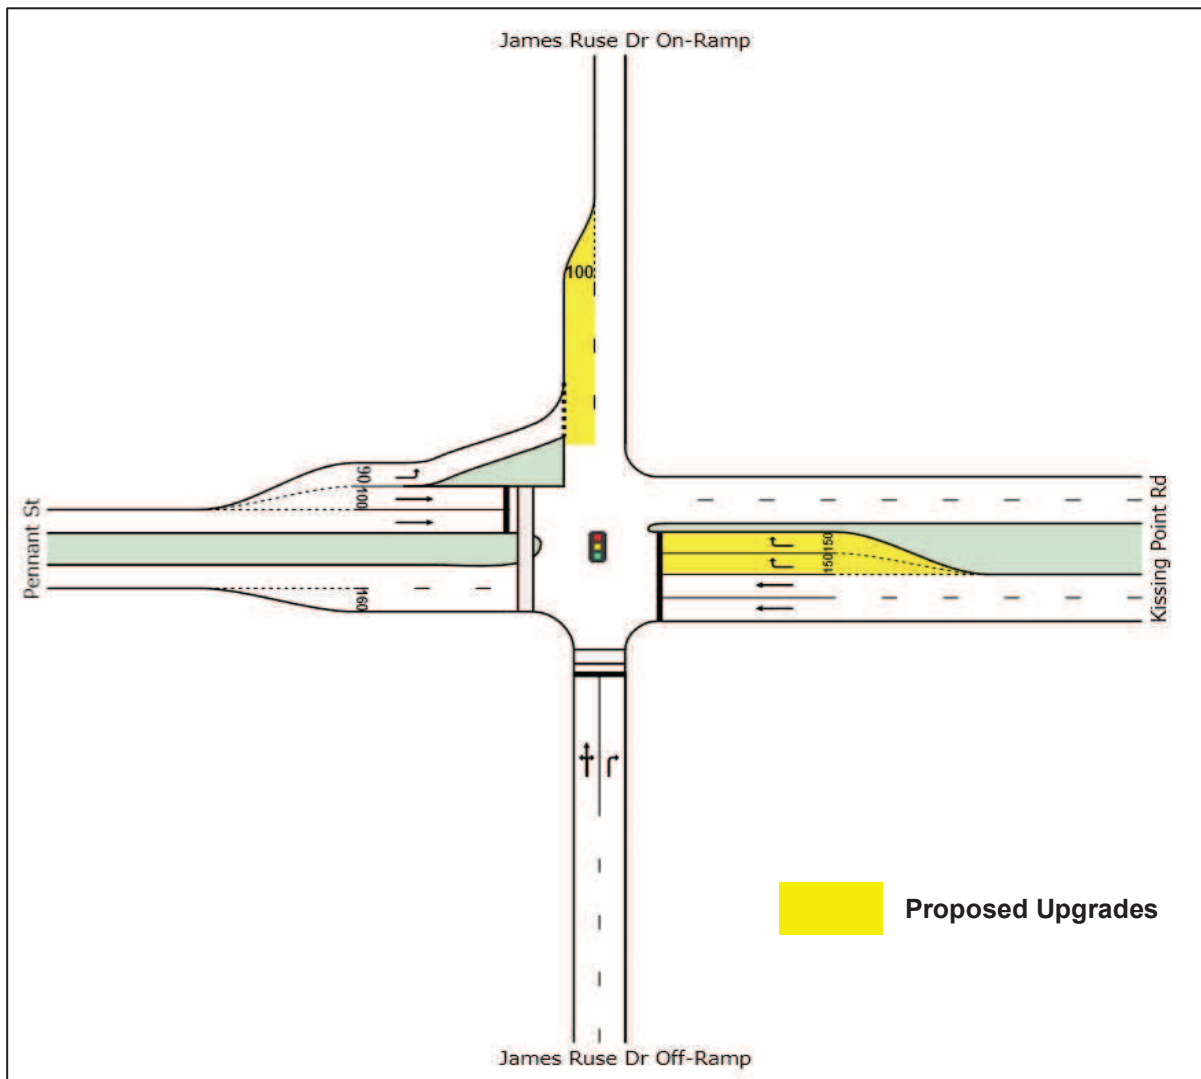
James Ruse Dr / Kissing Point Rd / Pennant St – Indicative Upgrade Layout
